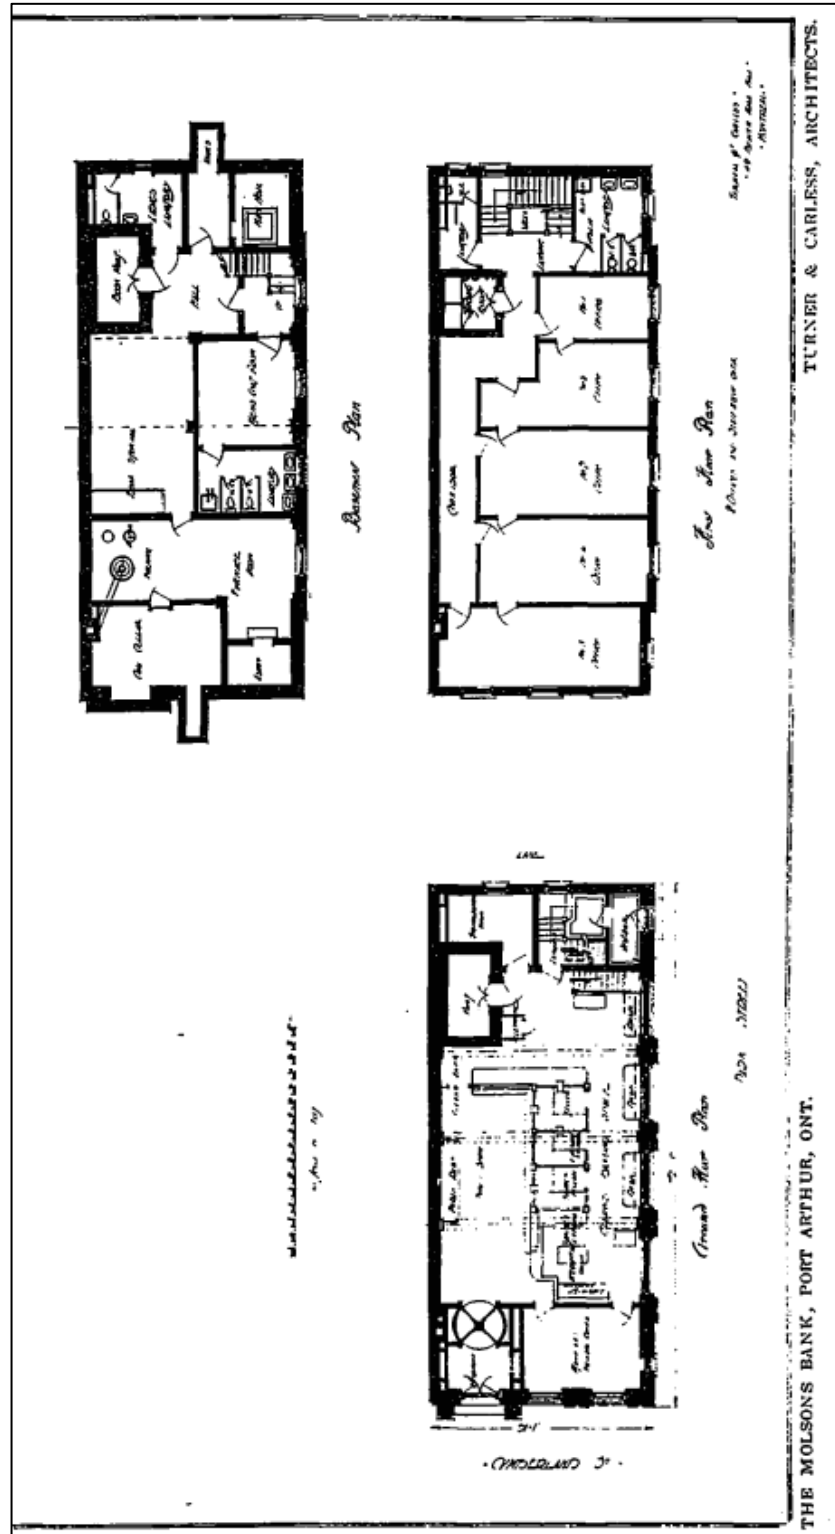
Original Interior Floor Plans of The Molsons Bank in Port Arthur in 1916 illustrating ground floor for banking activities and the manager's office, second floor offices, and third floor for the managers residence (Source: Turner, 1916)
